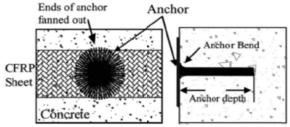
CFRP Anchor with a 360 degree fan, Orton (2008).
